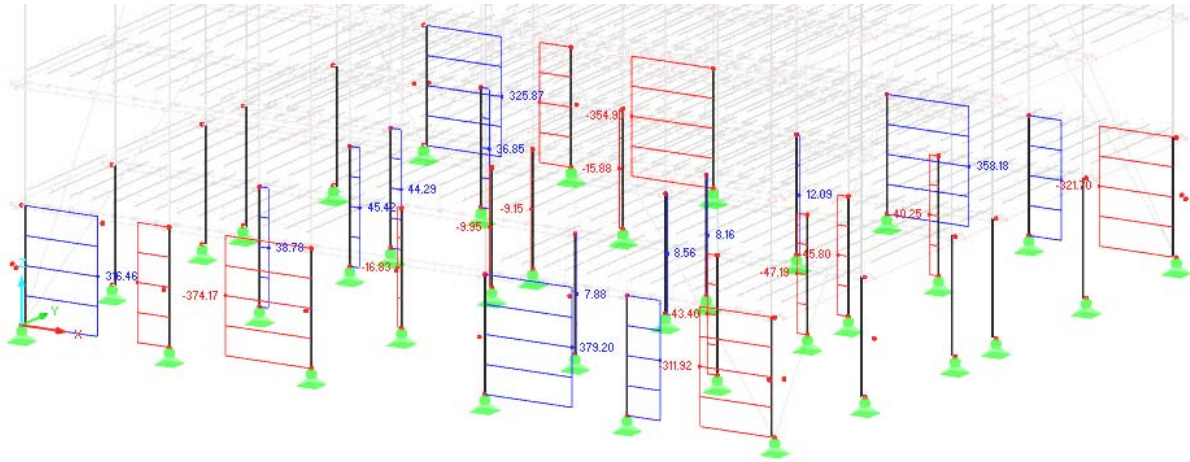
Internal normal forces in the columns of the frame construction in the first storey for LC2 (snow) in [kN]
